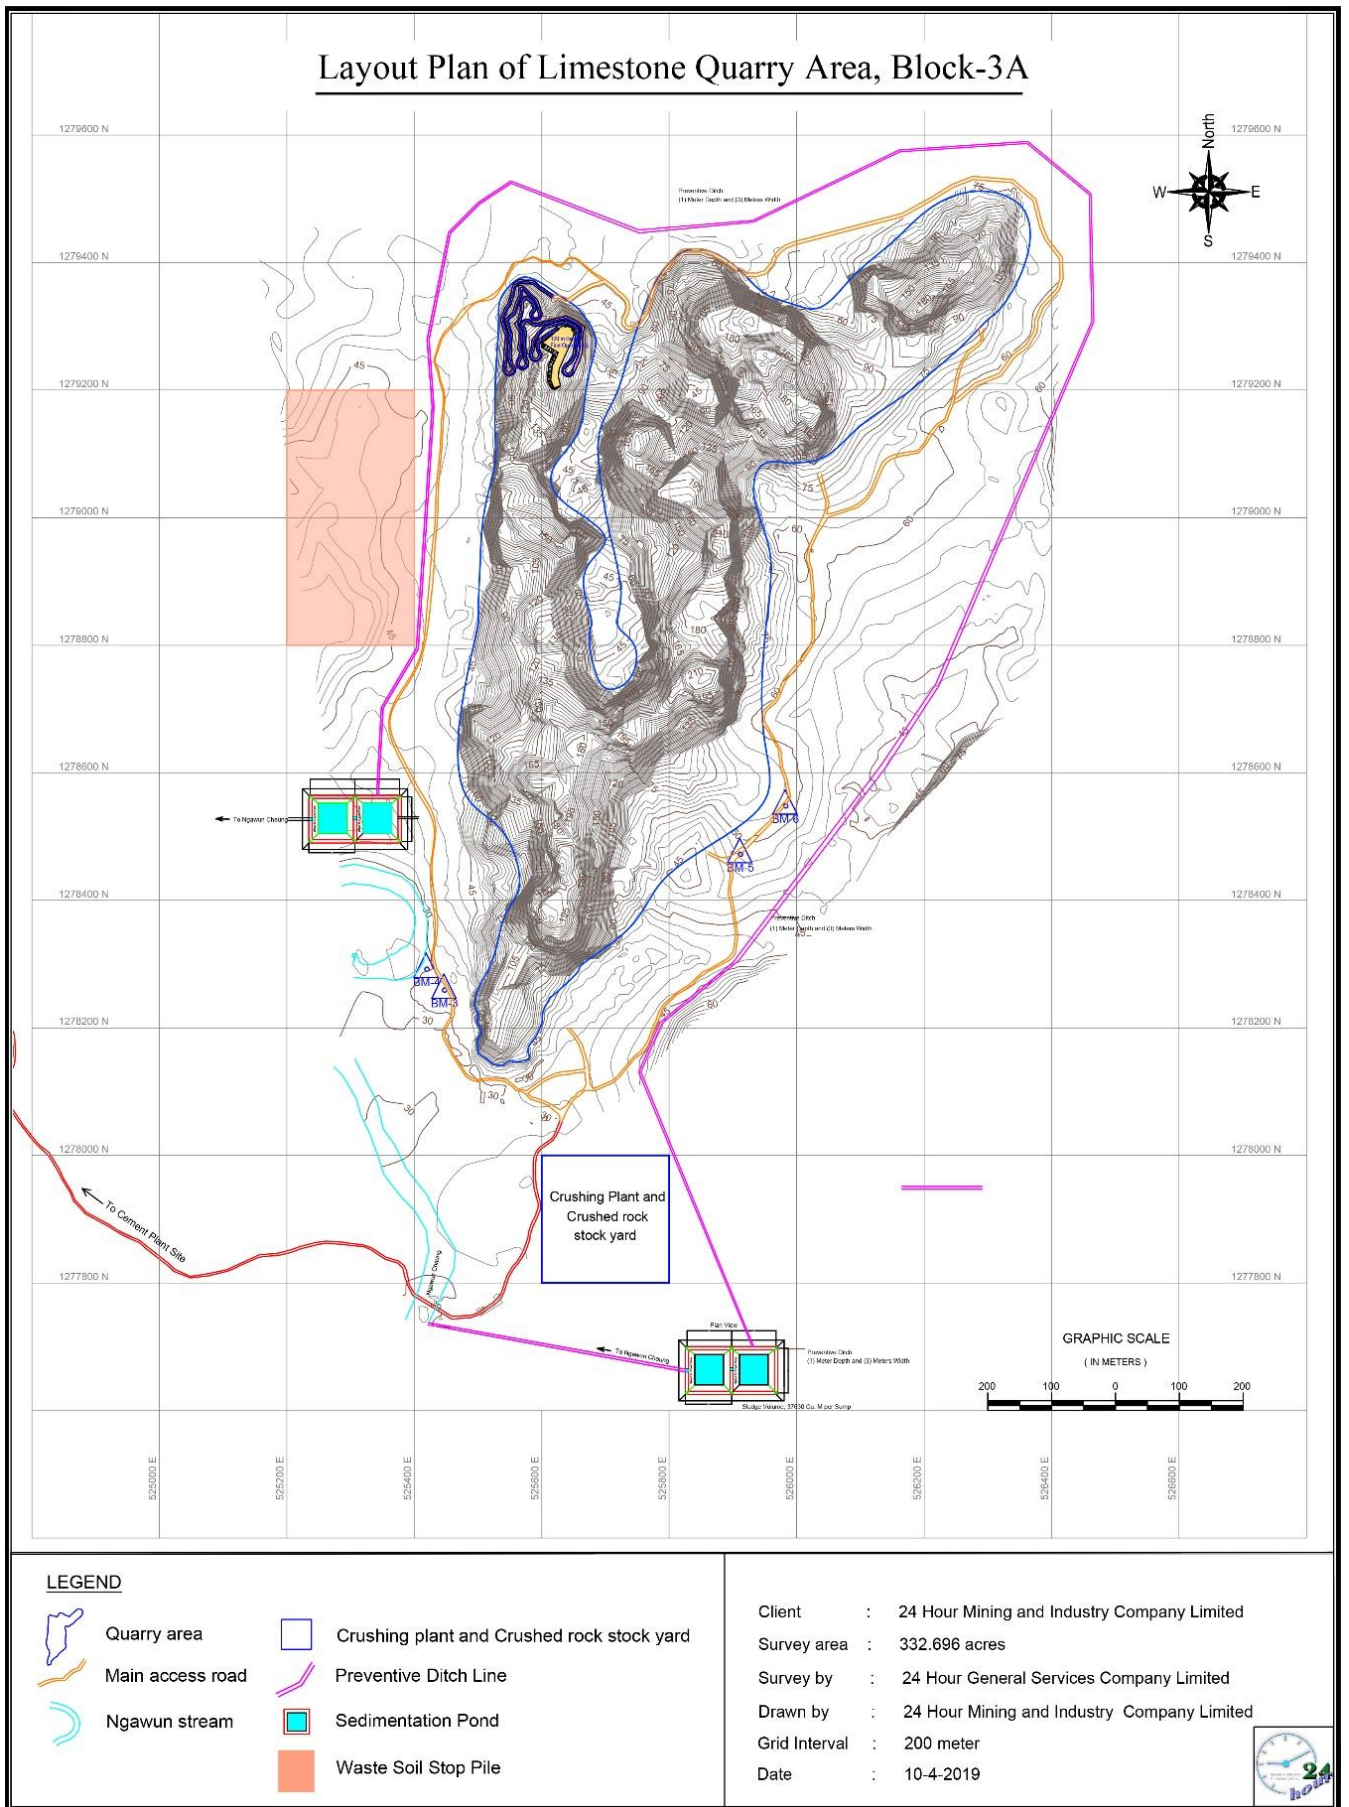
15 Layout plan map of Quarry area, Prevention ditch line, Sedimentation Ponds, Crusher & stock pile site and Access Road of Limestone Mining Area.
